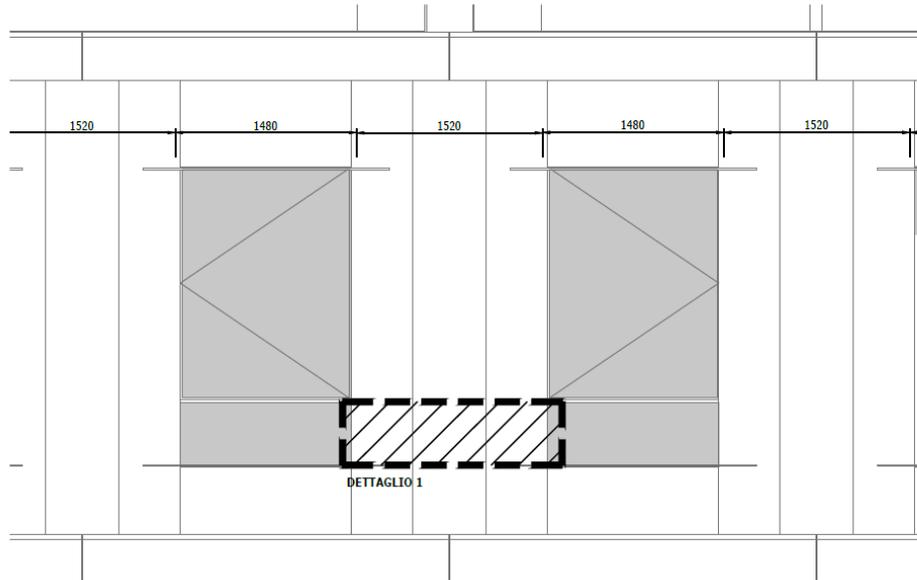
East Elevation WT-1C façade module Key. Source: Author
